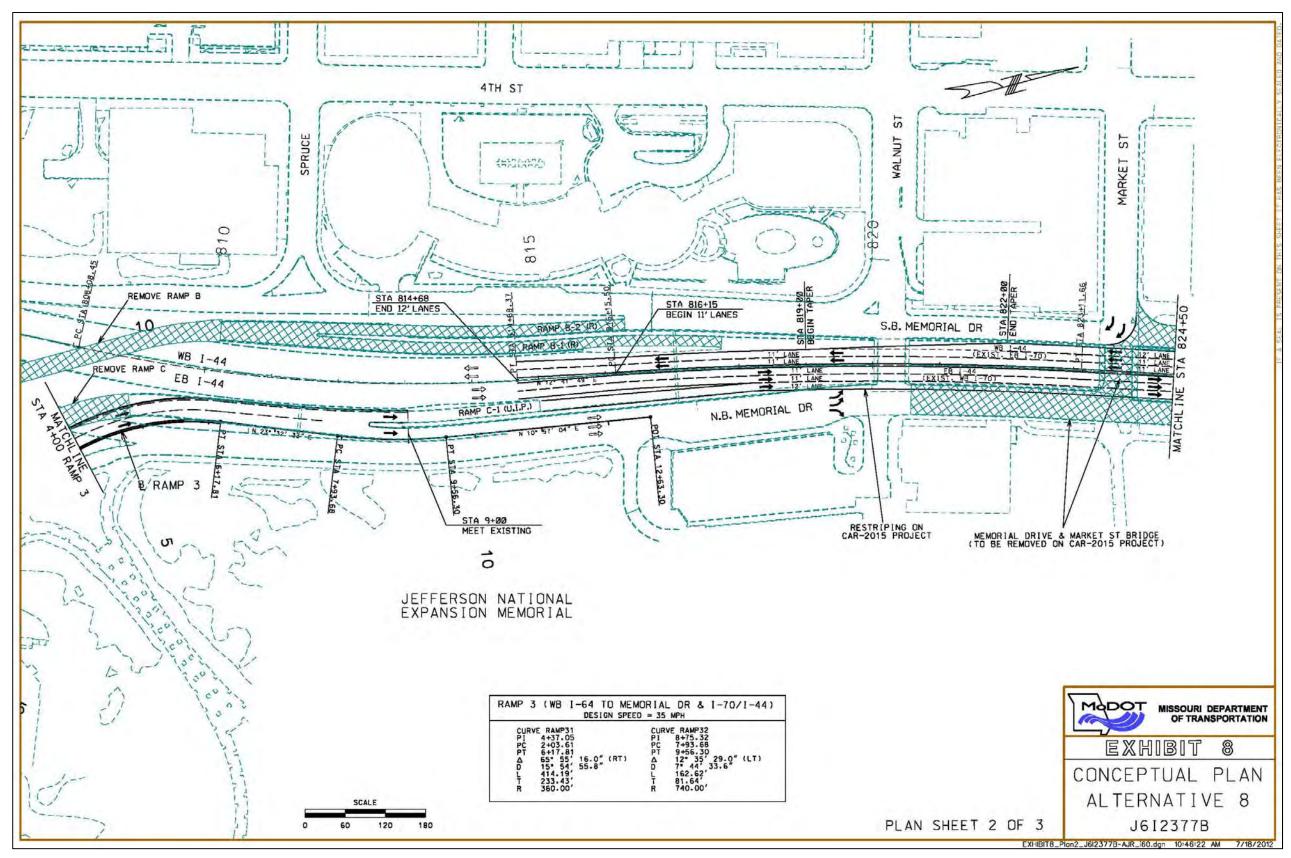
B: PSB Interchange Reconstruction Alternative 8, Sheet 2
